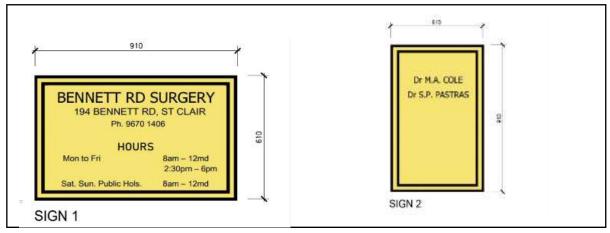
Proposed signage. Source: Proposed Floor Plan, Street Elevation & Signage Plan A2.2 Revision E, prepared by BDAA Accredited Building Designer, 30 March 2021.
